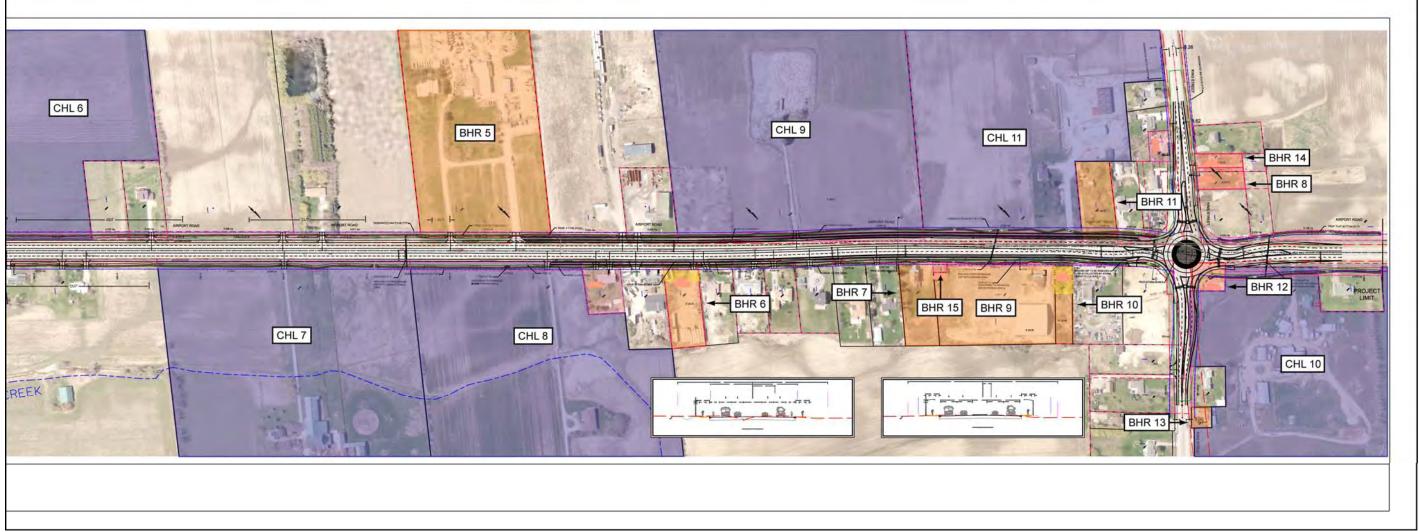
Proposed work for the Airport Road EA (Sheet 4)
